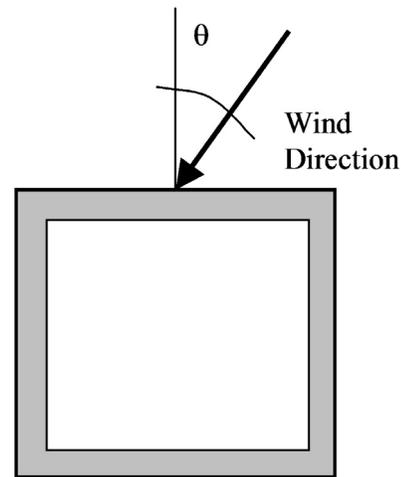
Plan view of building with definition of wind angle to exposed wall.
